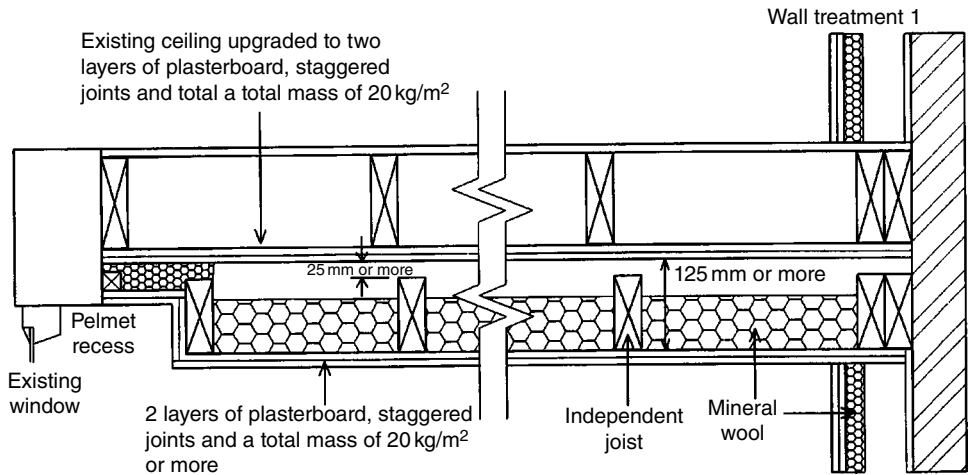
Construction details of Floor Treatment 1 showing junction with Wall Treatment 1.
